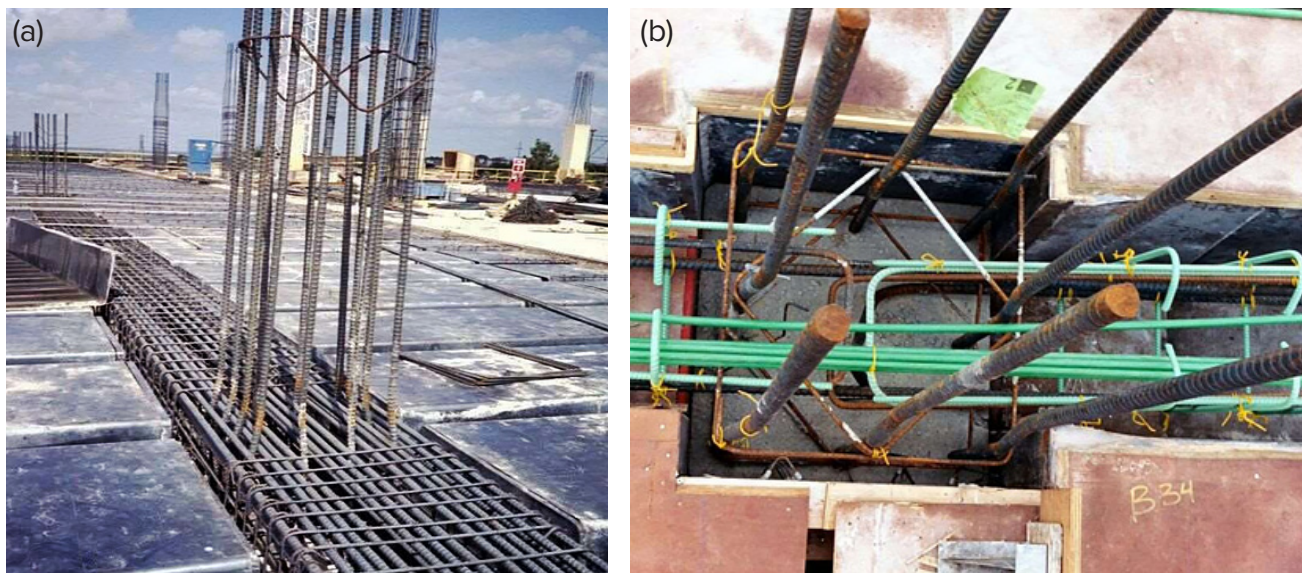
Formwork and reinforcement at column-beam intersections: (a) a desirable beam width allows crews to route beam reinforcement around column bars; and (b) an undesirable beam width adds to formwork complexity and can result in interference between beam and column bars. (Images courtesy of CRSI.)
